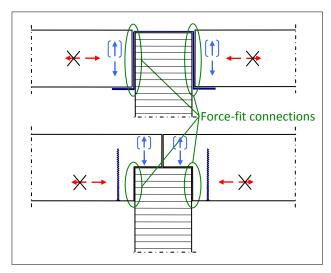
Connections to transfer axial compression forces and vertical loads, enabling detachment in case of failure
